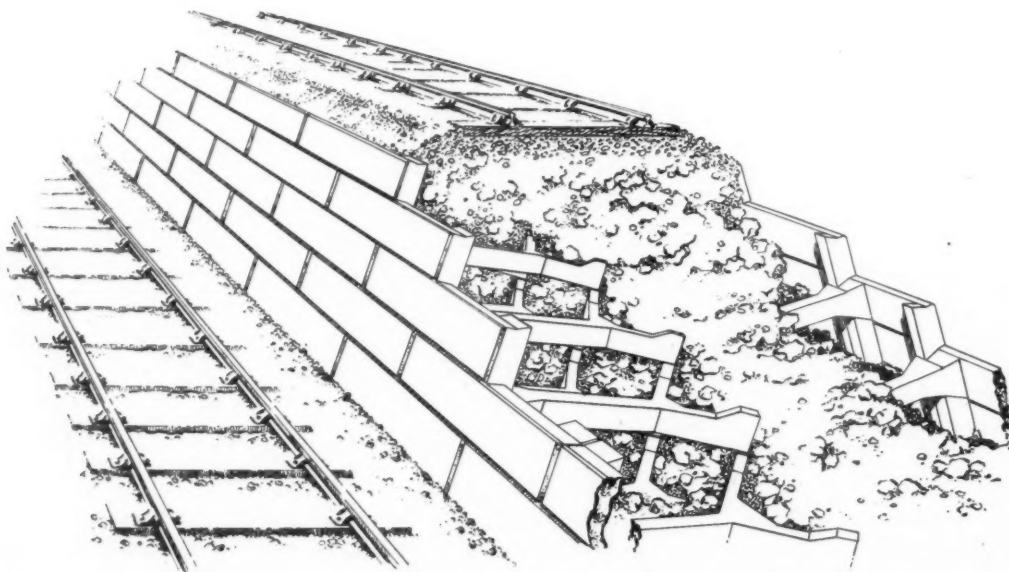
Showing the construction of crib walling comprising anchors and face members with dove-tail projections
